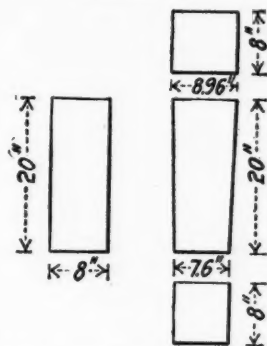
CONCRETE BLOCKS FOR TUNNEL ROOF
